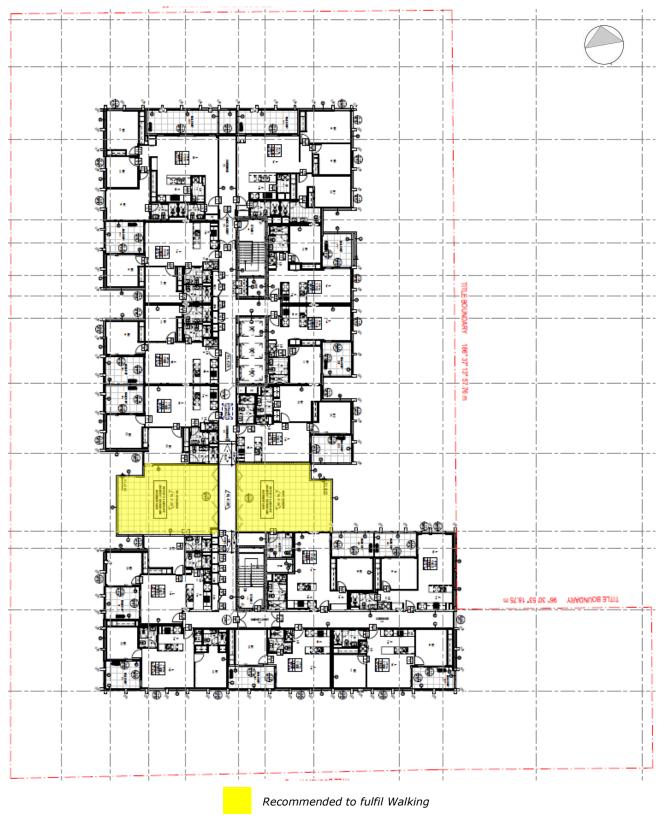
Level 11 floor plan with the recommended wind criteria overlaid.
